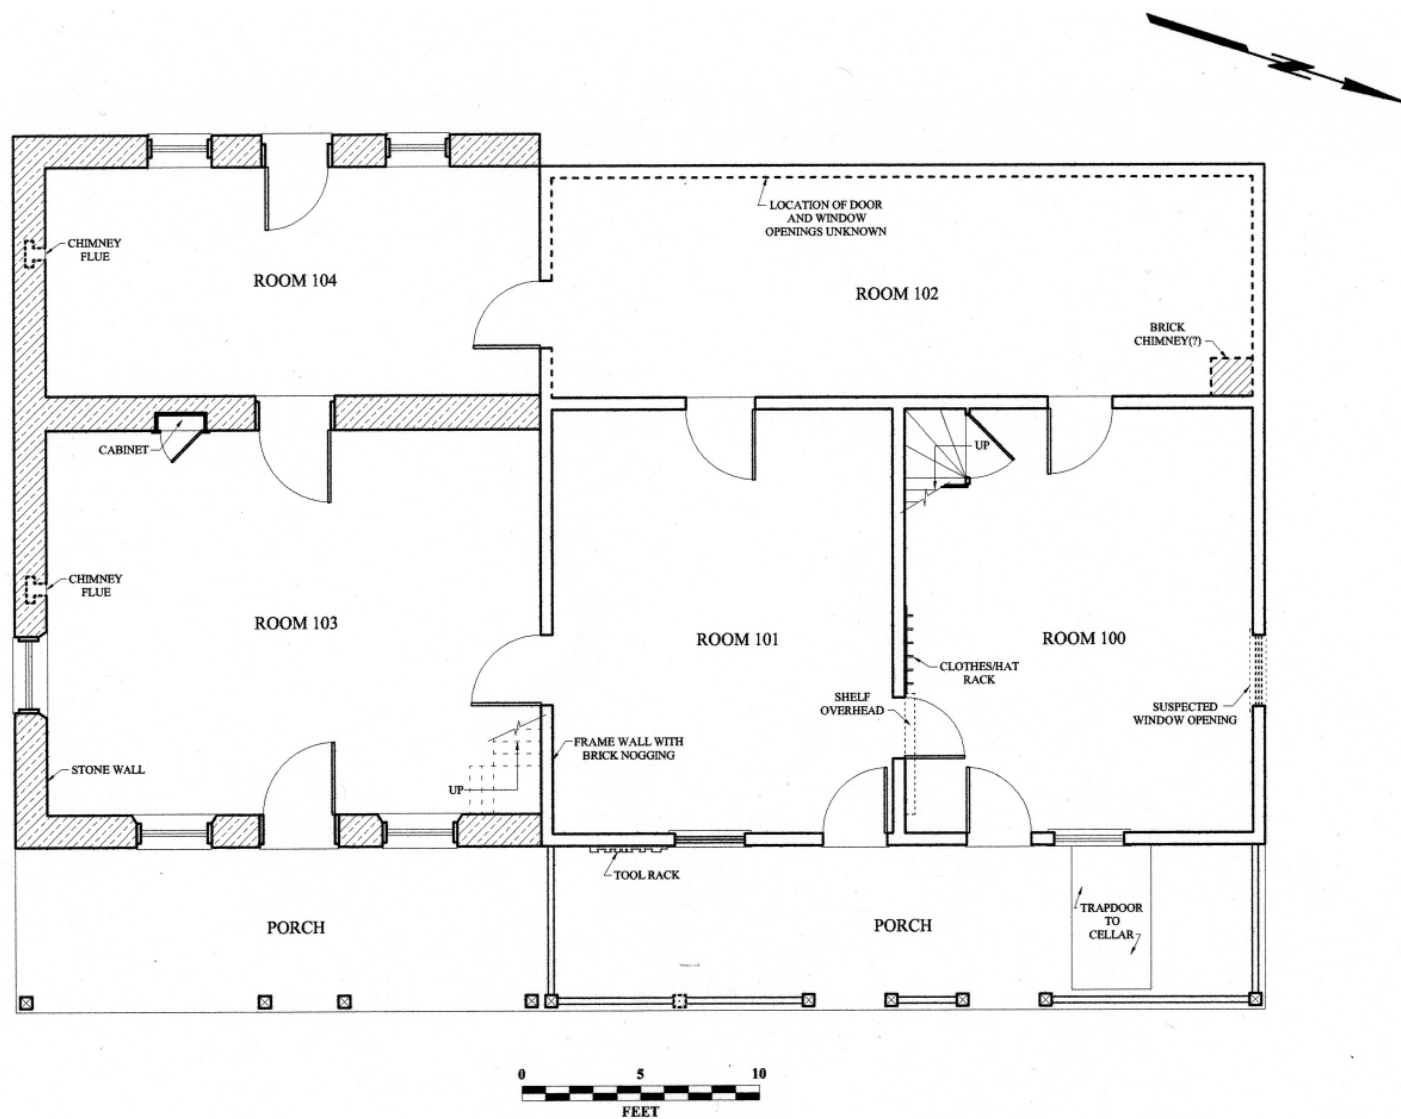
First floor plan of the house showing conditions circa 1860, following construction of the stone addition.
